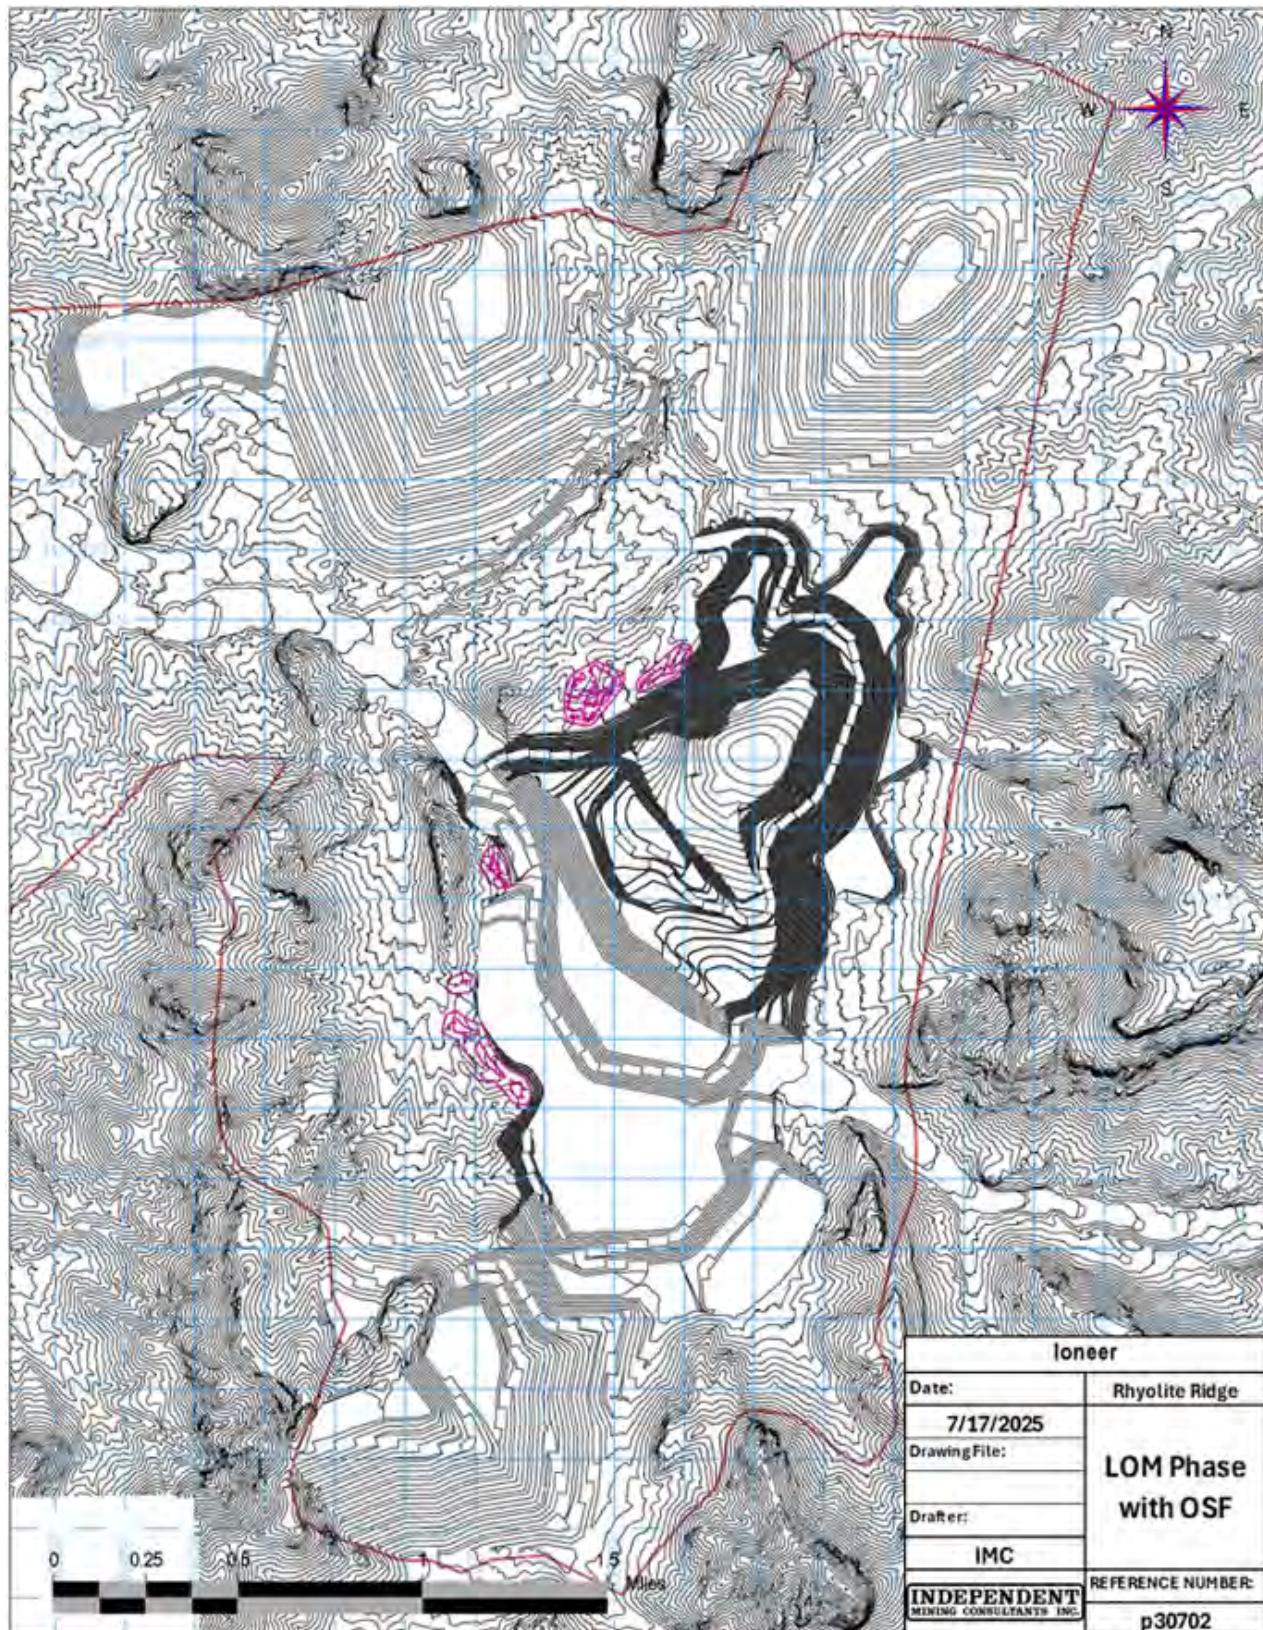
End of Mine Life Quarry and Overburden Storage Facility
